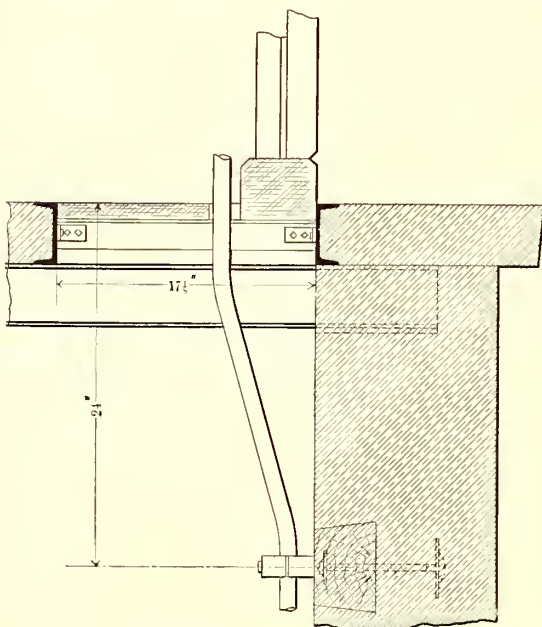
DETAIL OF LIGHTNING ARRESTERS AND HIGH-TENSION WIRING, BRIDGEWATER SUB-STATION
